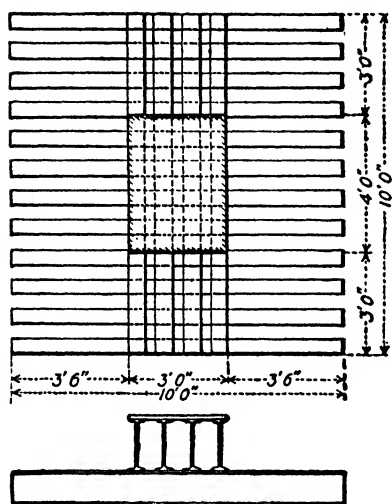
Steel I-beam Grillage for a Single Column.
